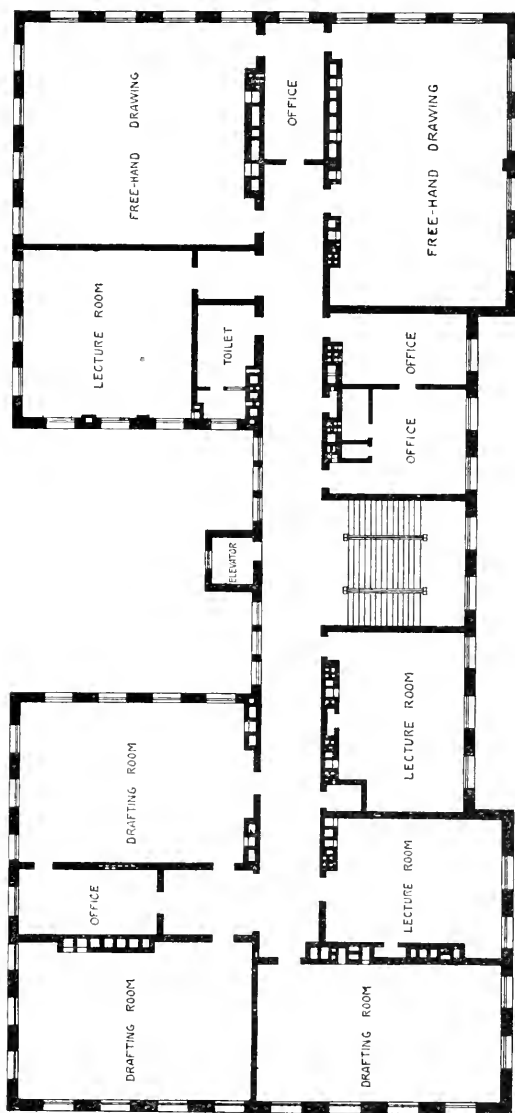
THIRD FLOOR PLAN OF THE R. E. OLDS HALL OF ENGINEERING.
